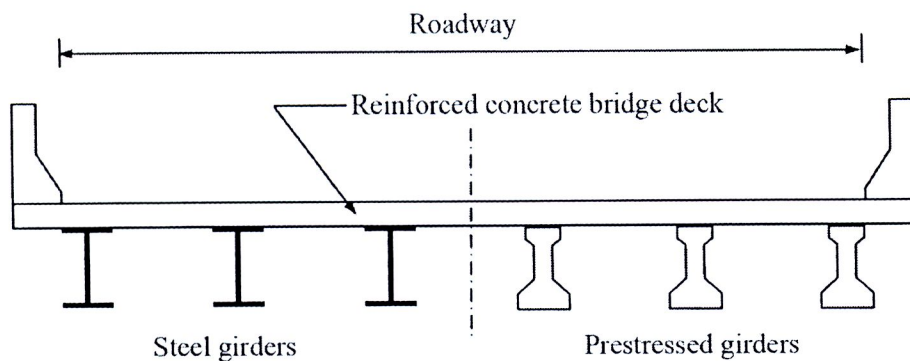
Typical cross sections of a reinforced concrete deck slab
